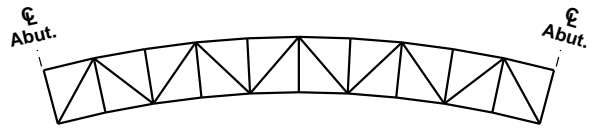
Warren-Type Single-Diagonal Top Lateral Bracing System for Tub Section Member: Plan View.
